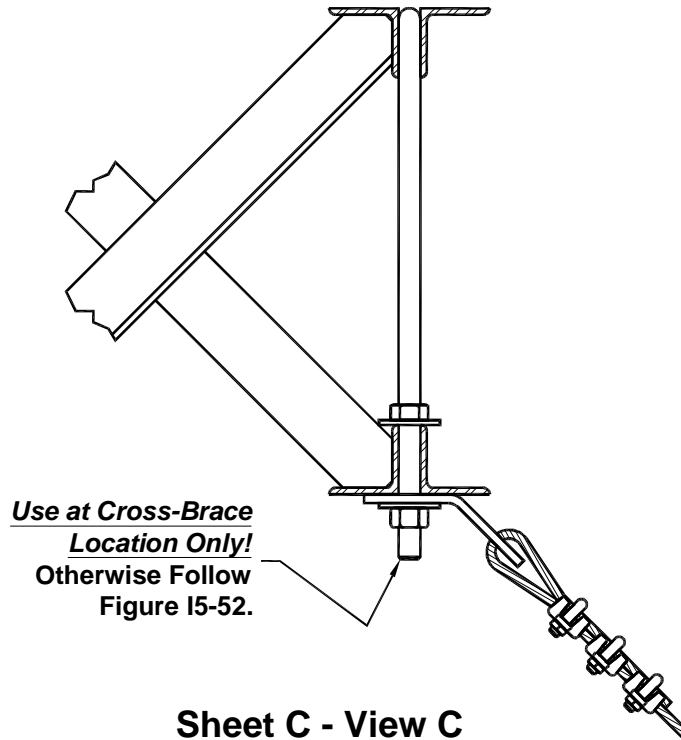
; Attaching KSCC Brackets to Cross-Braced Open Web Steel Joists
